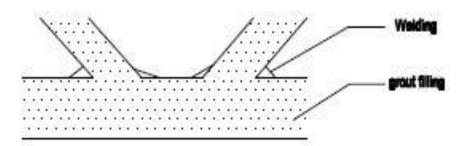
Connecting K joint with dry weld and grout filling
